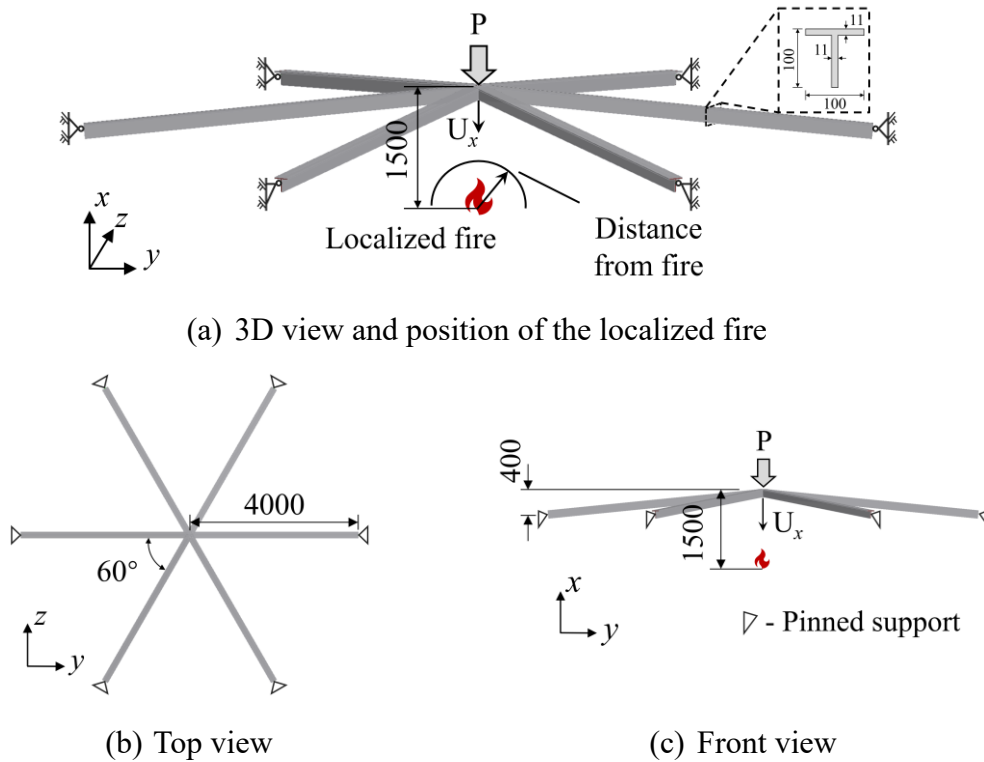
Layout and dimensions of the star shaped dome roof (unit: mm).
